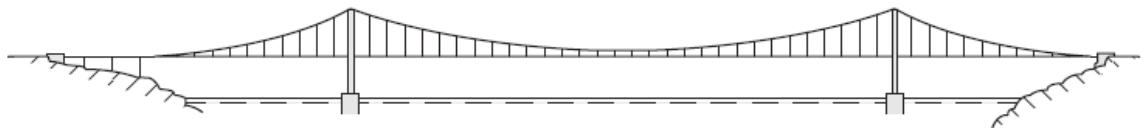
Suspension bridge side view (Åkesson, 2008)
